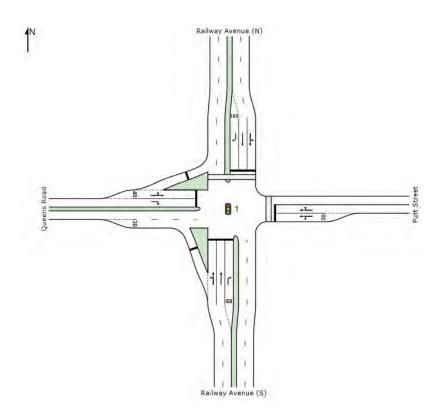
Railway Avenue, Queens Road and Putt Street existing layout as modelled
